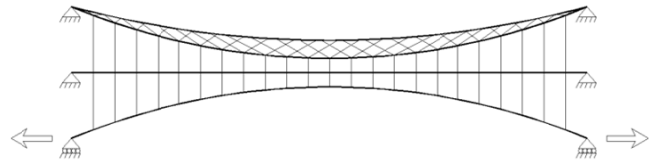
Suspension bridge stabilization by the using of prestressed stabilization cable and cable truss
